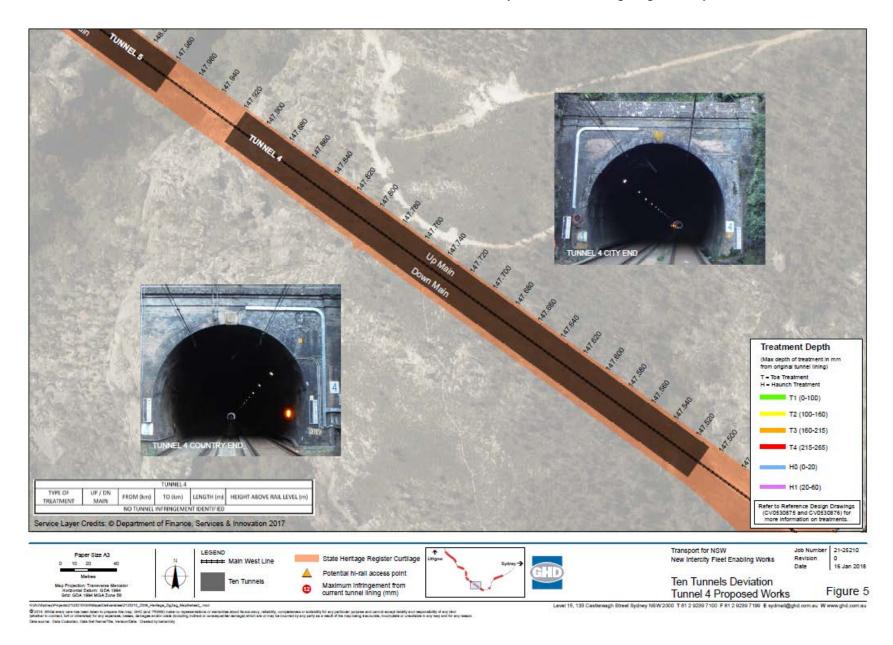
Proposed treatment overview for Tunnel 4 and Tunnel 5 (GHD Great Zig Zag Railway deviation tunnels Heritage Design Summary 2018)
